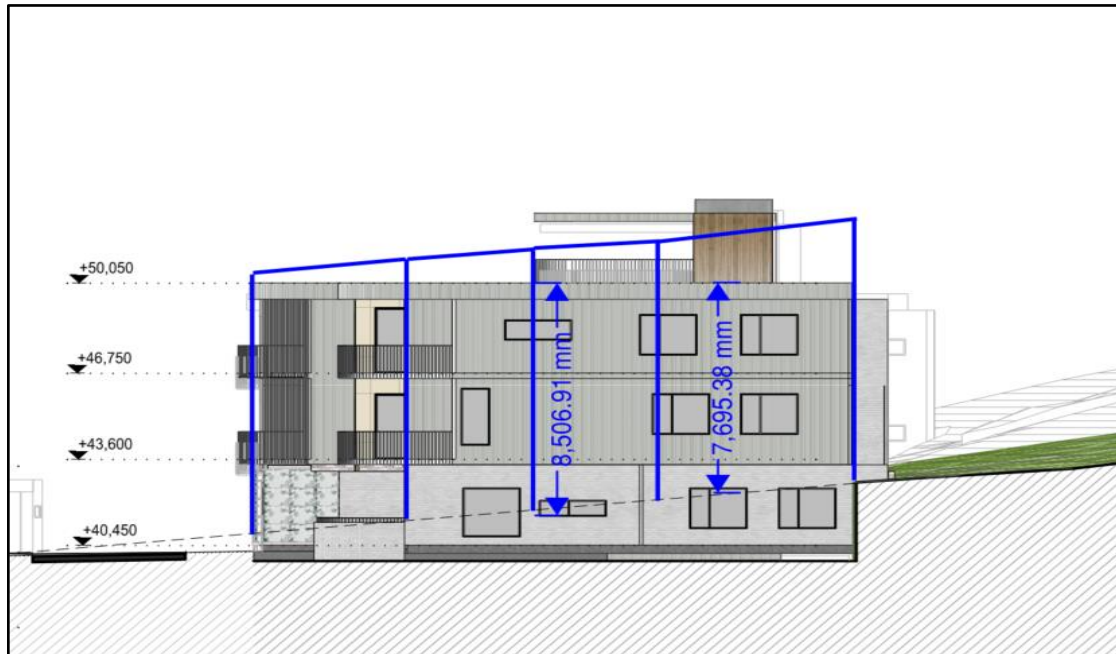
Building envelope determined by the Eastern boundary as viewable from within the site at Southern Elevation 02. Note lift overrun is set further to the north of this elevation.
